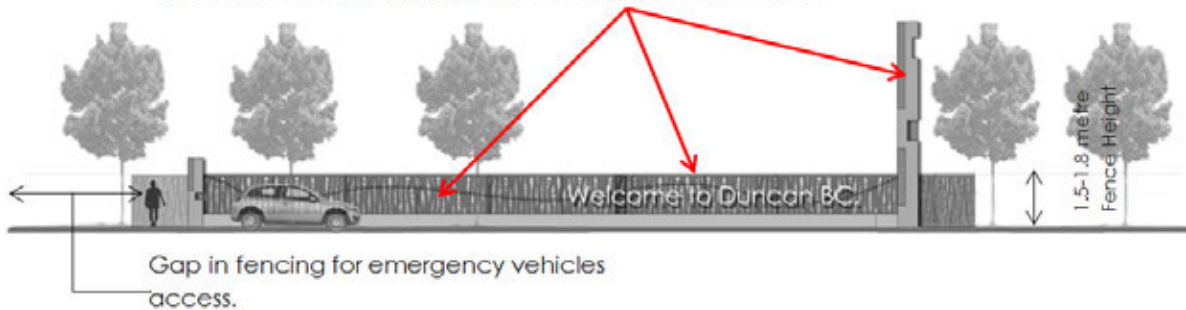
Gateway Improvement Examples at the Cowichan River Bridges
